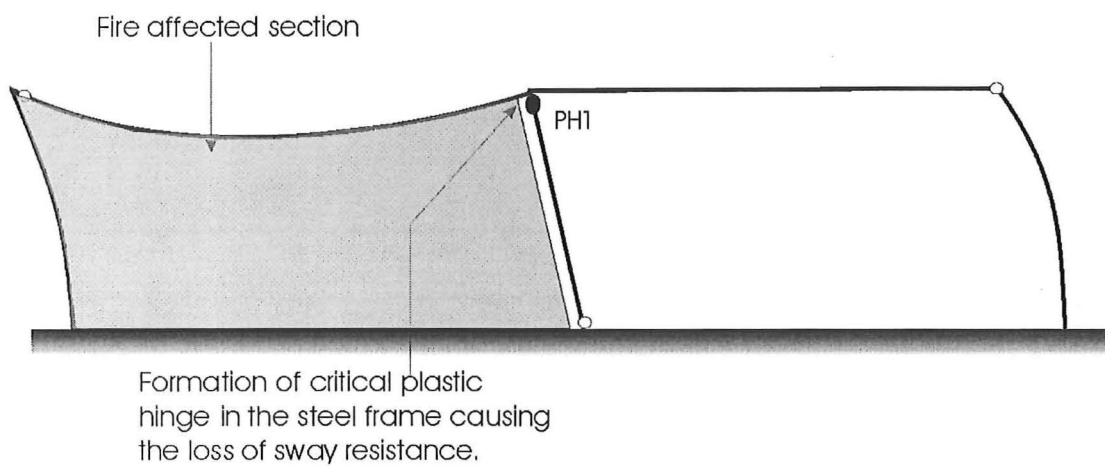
Outward collapse of frame due to formation of plastic hinge in the steel column.
